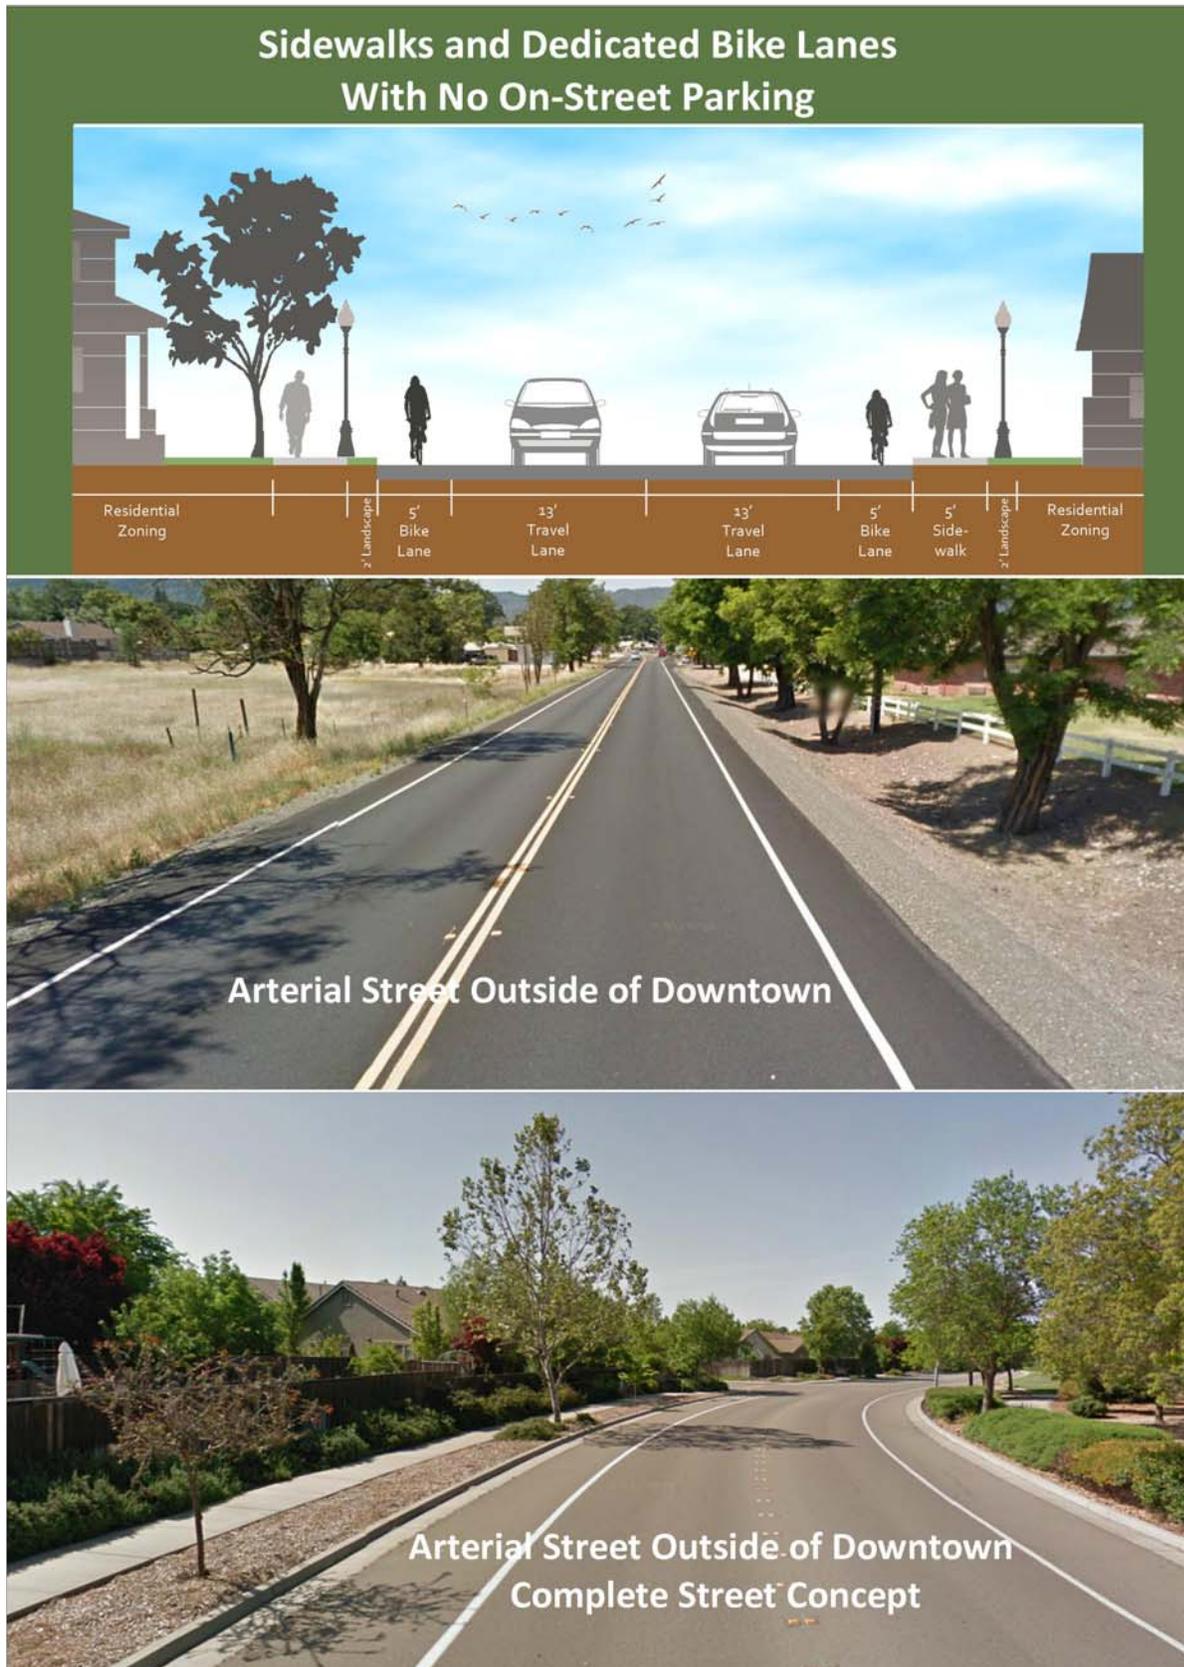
LOCAL ROADWAYS IMPROVEMENT CONCEPTS
